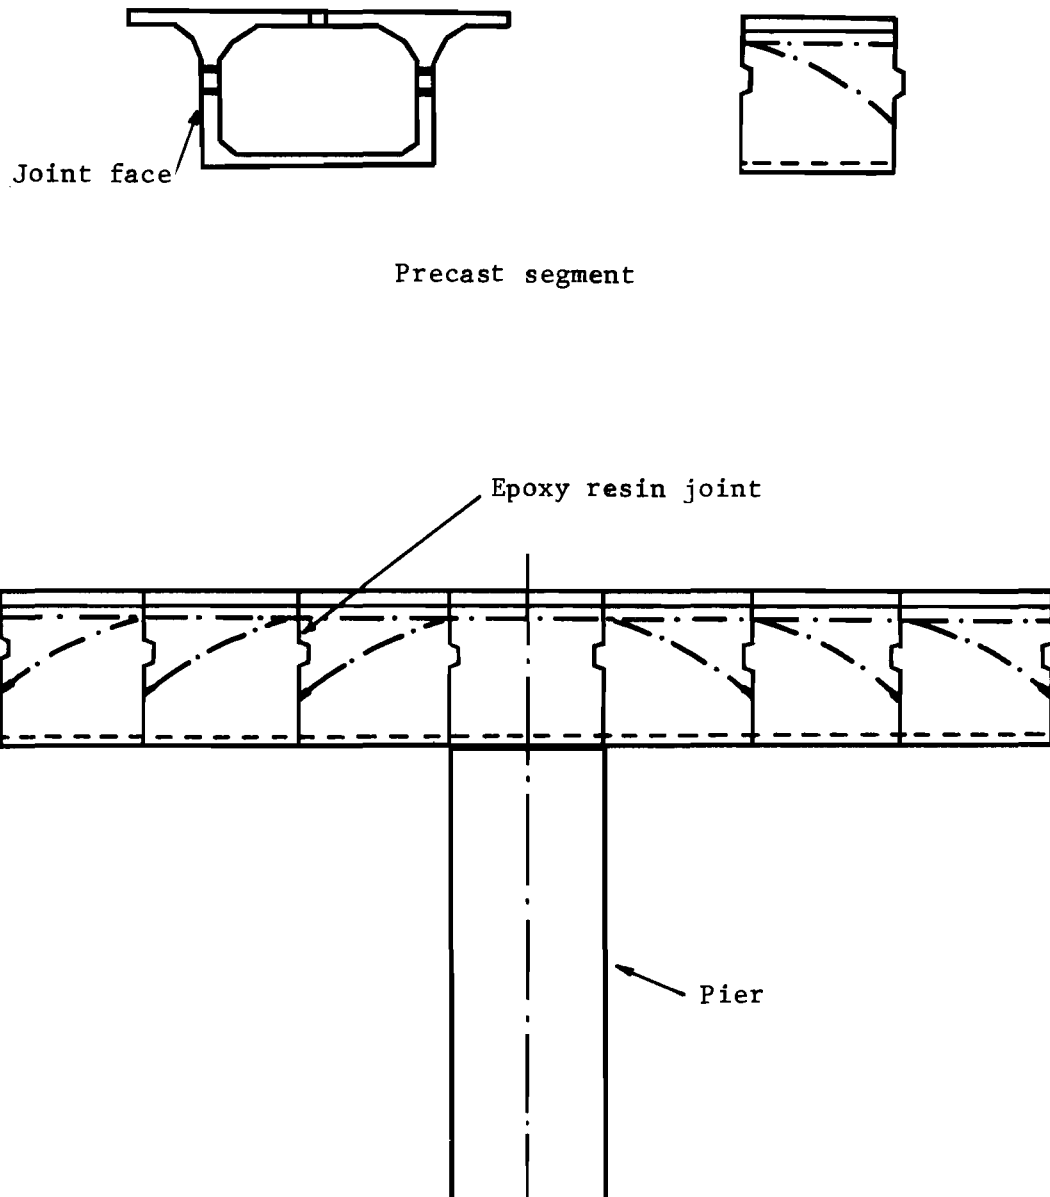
Construction of a segmental precast concrete bridge by the cantilever construction method.
